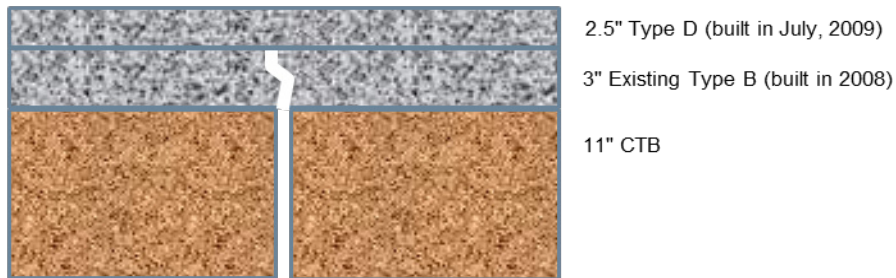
Schematic Diagram of SH 24 Pavement Structure.
